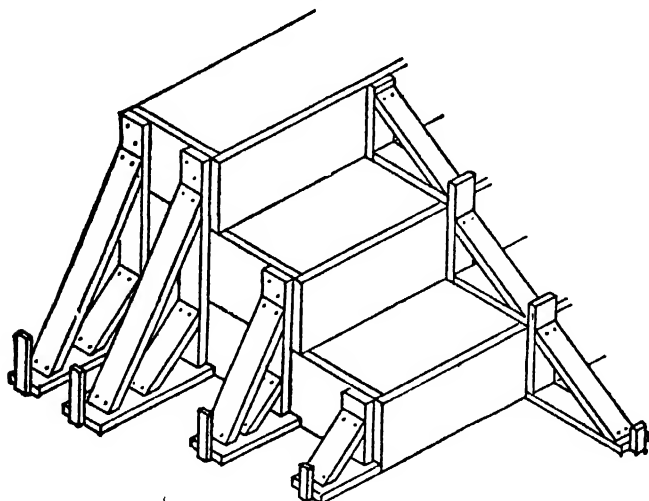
,770.—Forms for concrete steps showing proper method of bracing.
